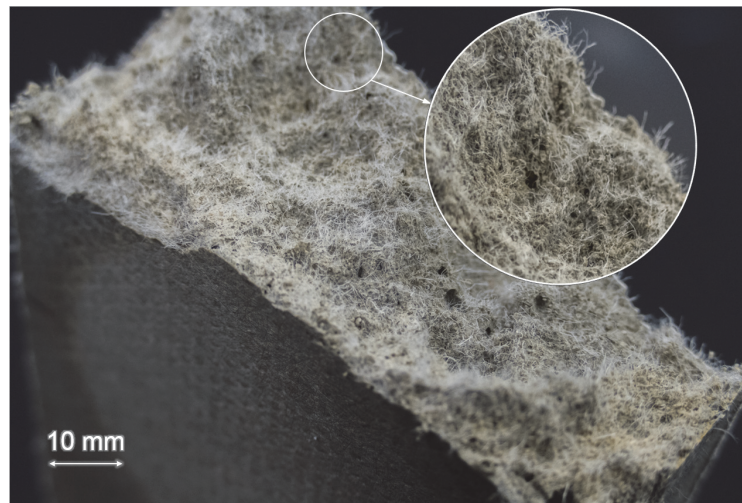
\_ Fracture surface of a PE-UHPFRC tensile specimen (total fiber length = 6 mm)
